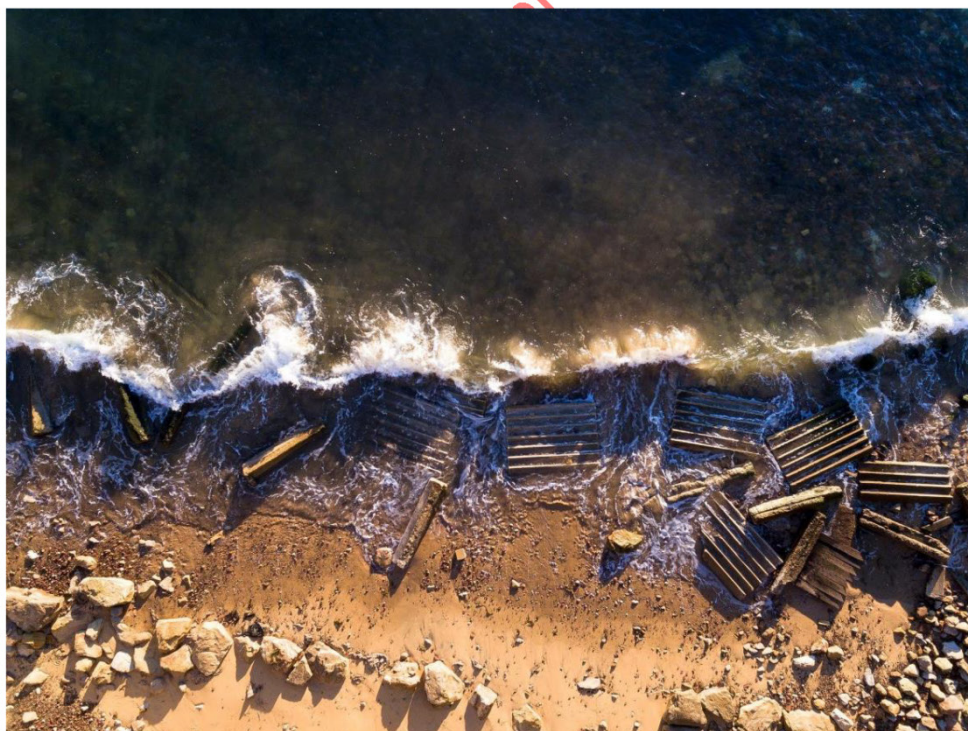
Terrigal beach erosion and exposed former sea wall (aerial view).
